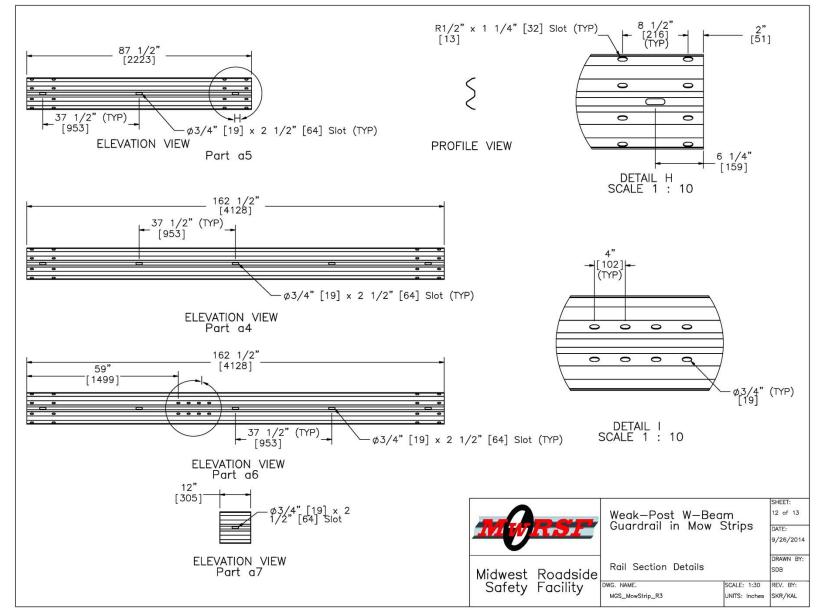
W-Beam Guardrail and Backup Plate Details, Test No. MGSMS-1
